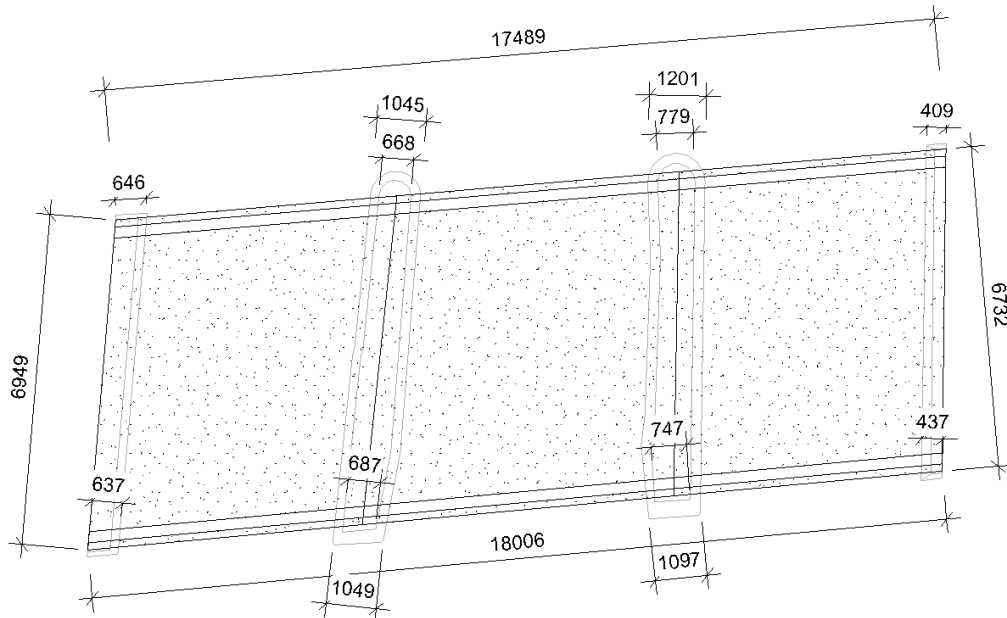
Floor plan dimensions of Øvre Kvamme bridge from Revit
